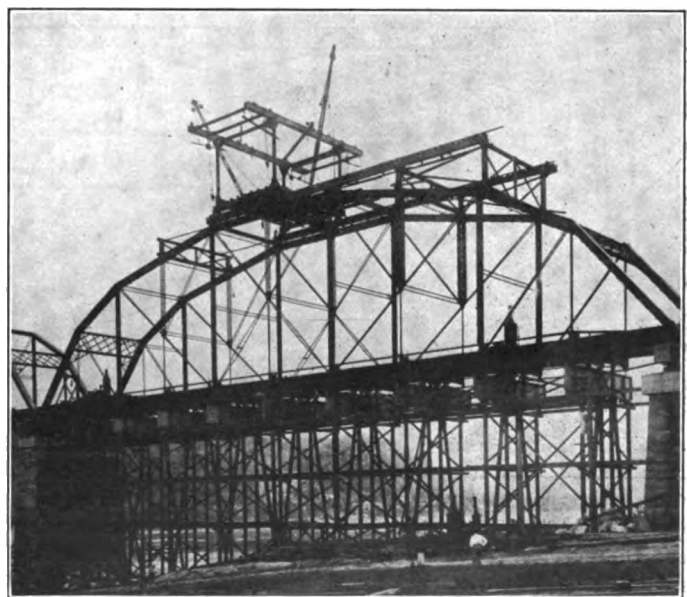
Old Span 1 Showing False Work Carrying Traffic and Small Traveler Erected on Old Trusses to Place New Span.
